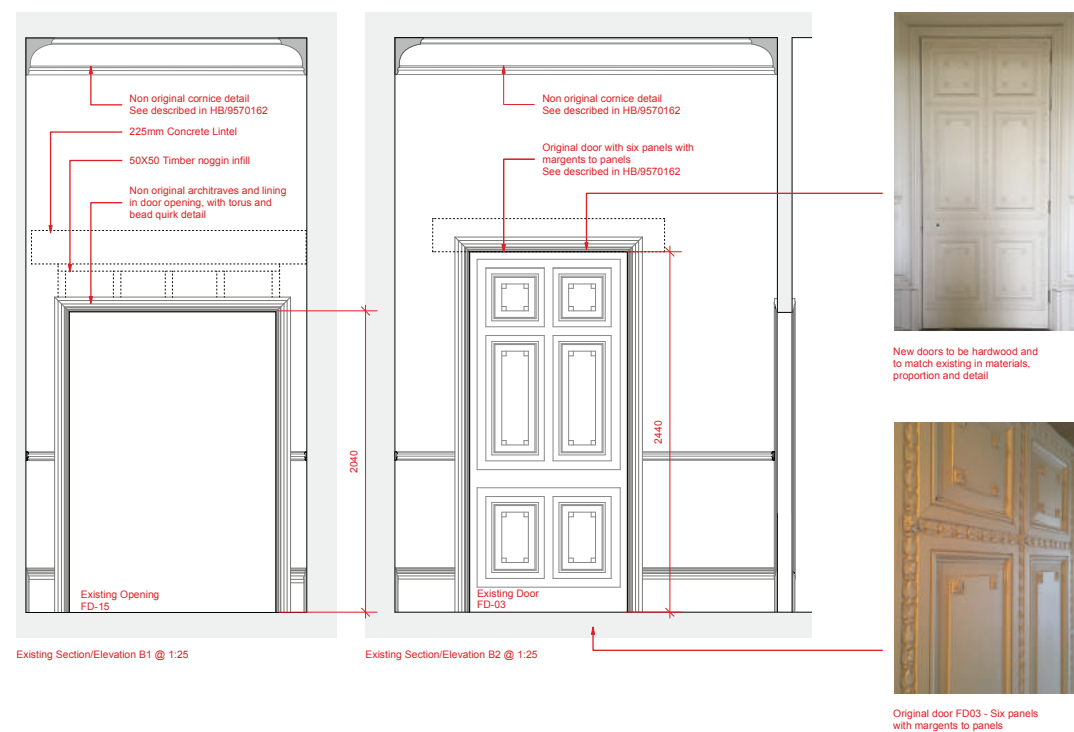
Existing Elevation B1 & B2 - 2 Flat 2, 5 Cambridge Gate
